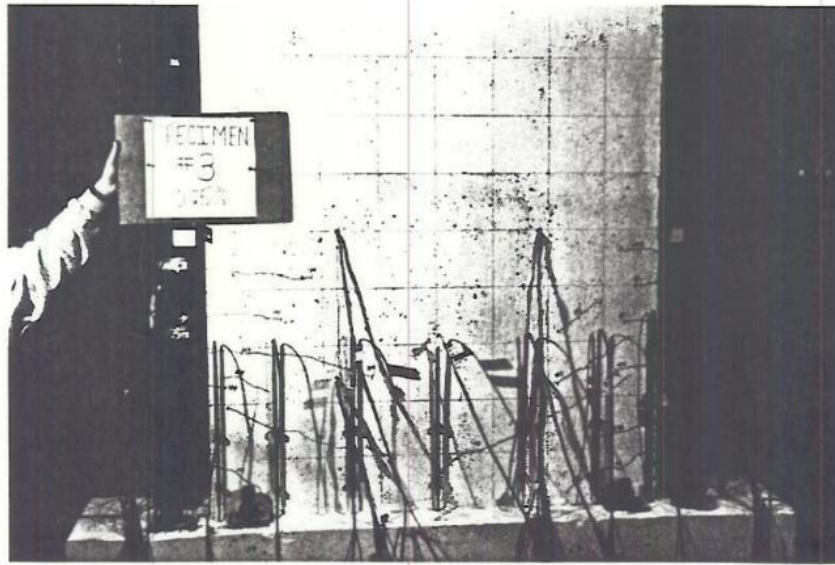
LVDTs installed on specimen RW2 tested by Thomsen and Wallace (1995)
